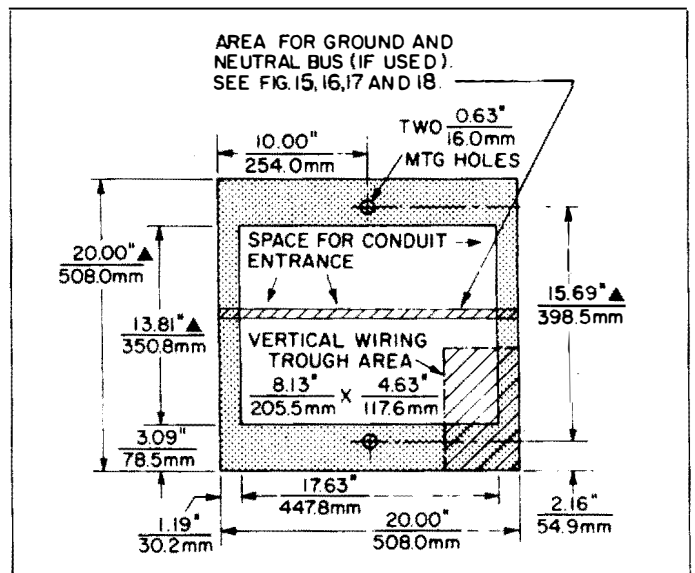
Bottom conduit entrance space 20-inch (508.0 mm) deep section. For 22-inch deep sections, add 2" (50.8 mm) to ▲ dimensions.
